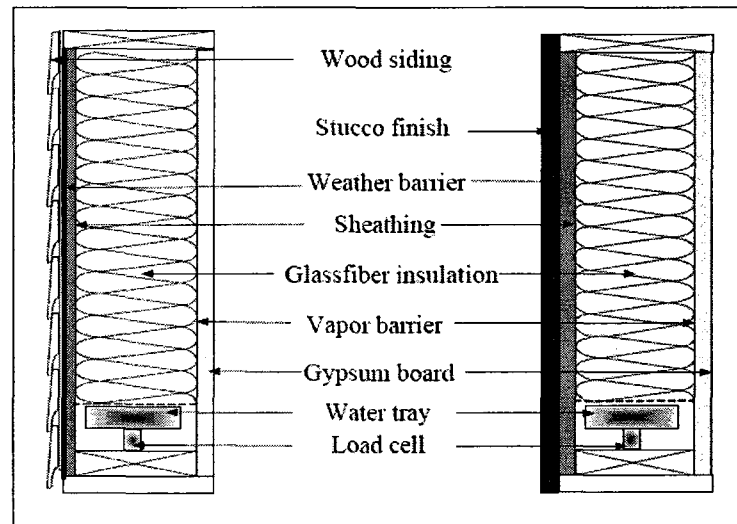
Configurations of tested wall panels. Water tray was put at top of the bottom plate in stud cavity (Fazio et al. 2007)
